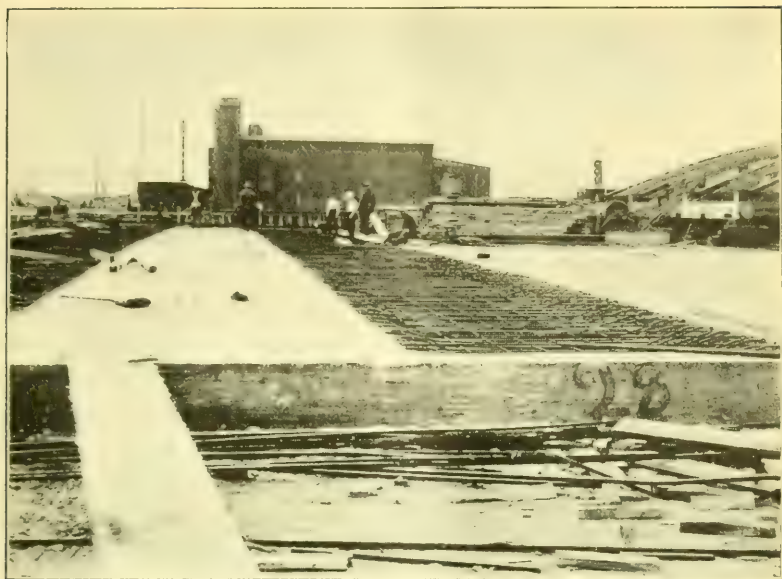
STRIP OF CONCRETE DECK AND STEEL REINFORCEMENT.
